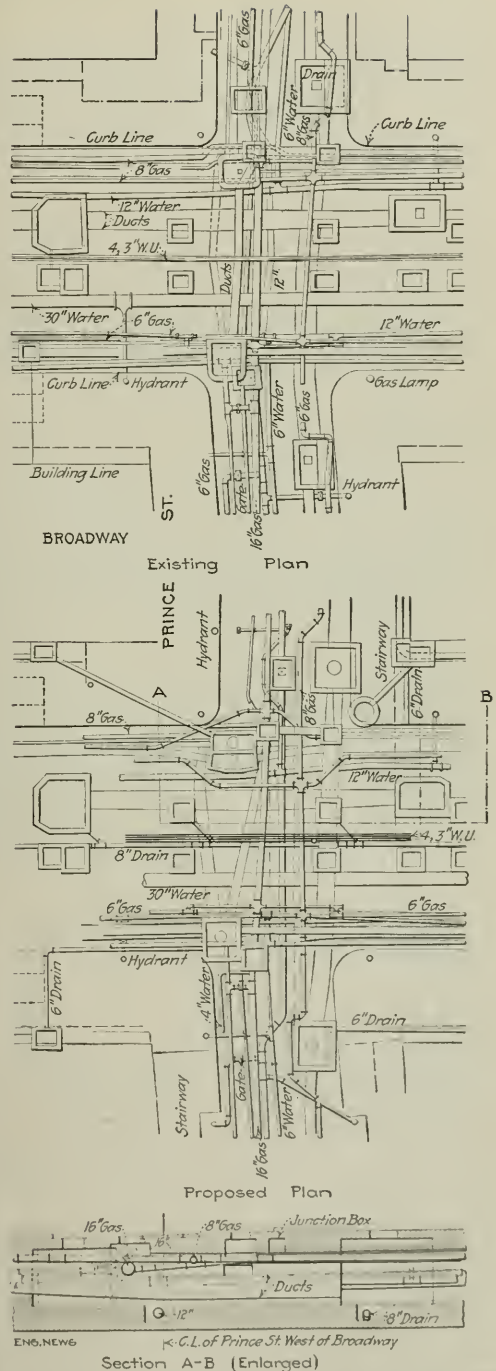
A TYPICAL REARRANGEMENT OF UNDERGROUND PIPING AT A STREET INTERSECTION, OLD AND NEW PLANS OF UNDERGROUND PIPING AT BROADWAY AND PRINCE ST.
